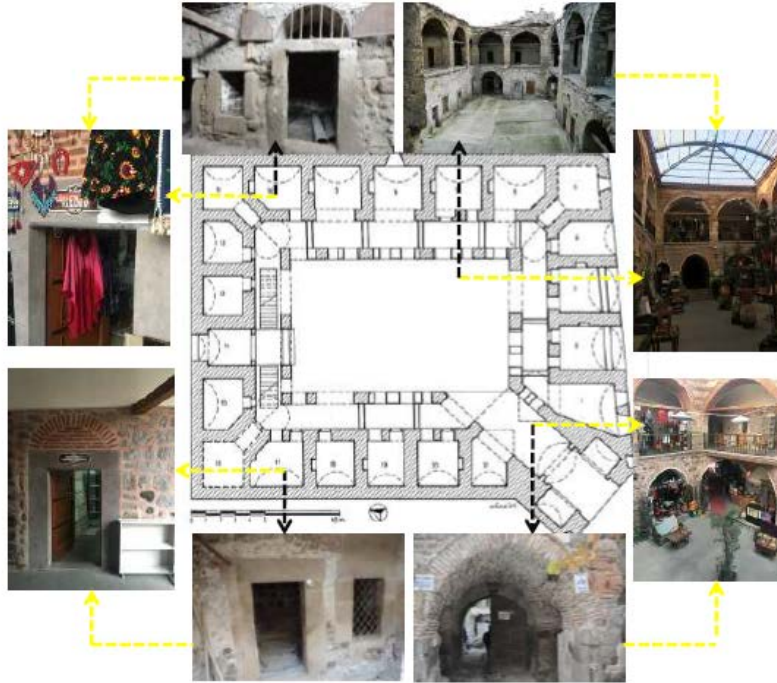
Taşhan ground floor plan (Daş,1997) and visuals for the plan diagram (Archive).
